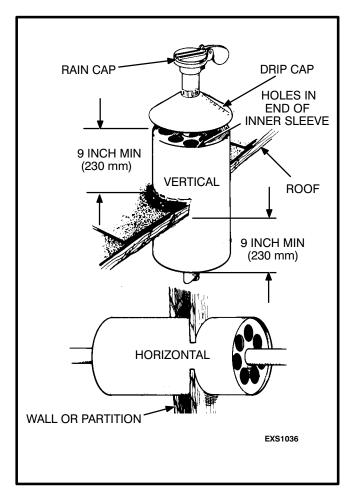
MOUNTING EXHAUST THIMBLE
